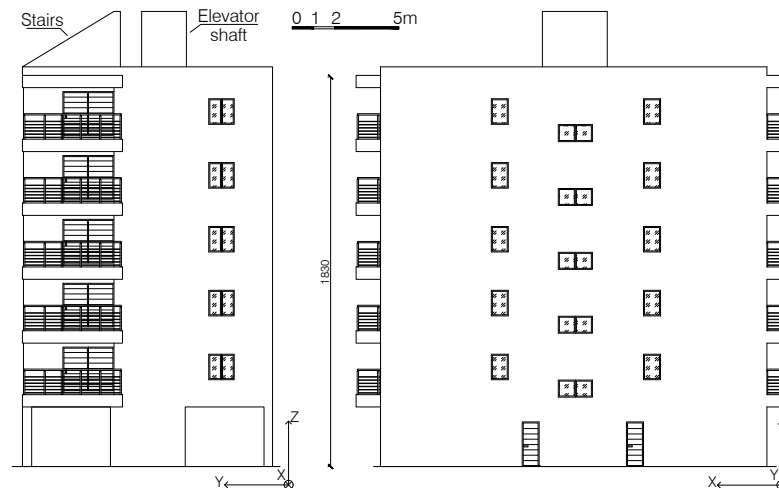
Building elevation in X direction on the left, and Y direction on the right.
